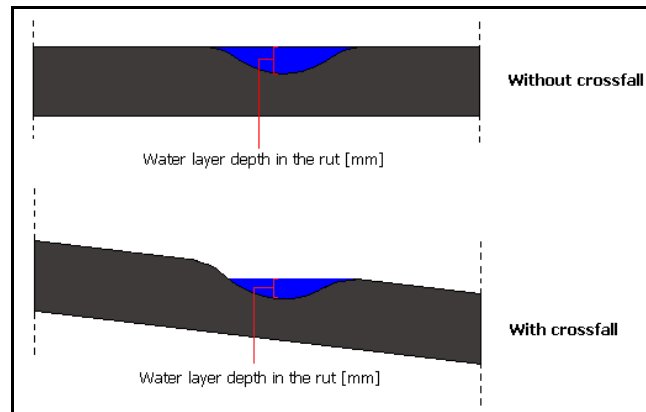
Difference between the water layer depth in a rut on a pavement with and without crossfall.
